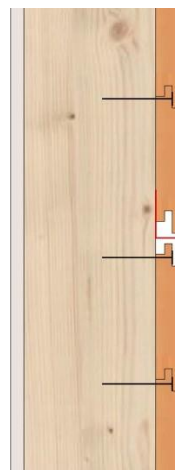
Storey to Storey Expansion Joint for Profiled Timber Cladding
